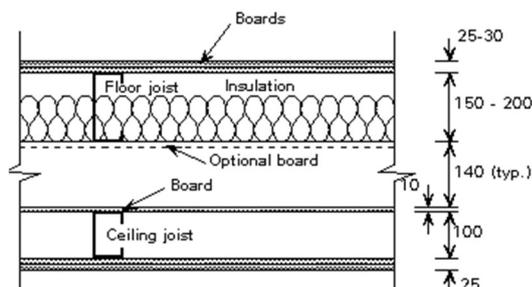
Standard floor and ceiling system (Steelconstruction.info).
